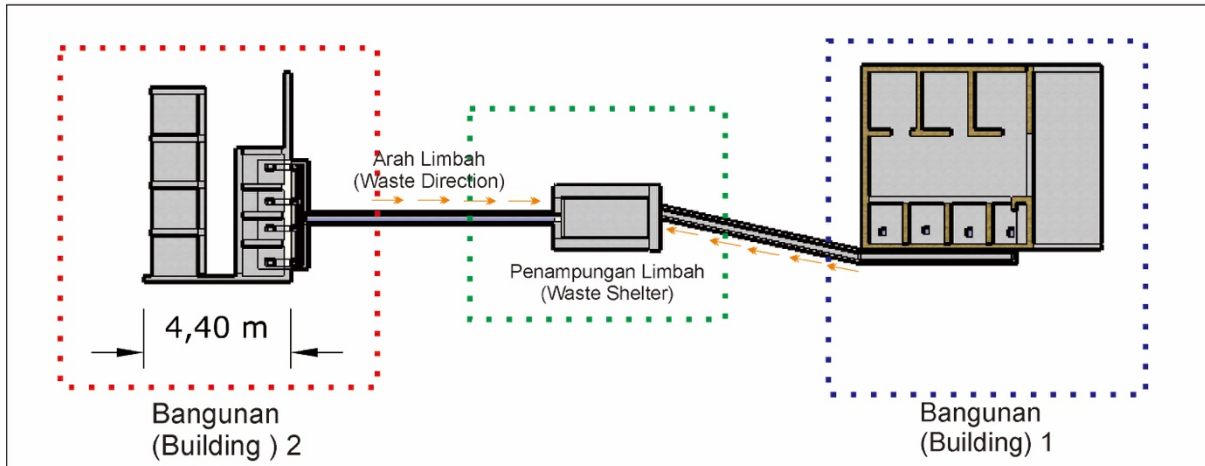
Building Reconstruction at A3 Area, Kendari II Airfield Area,
